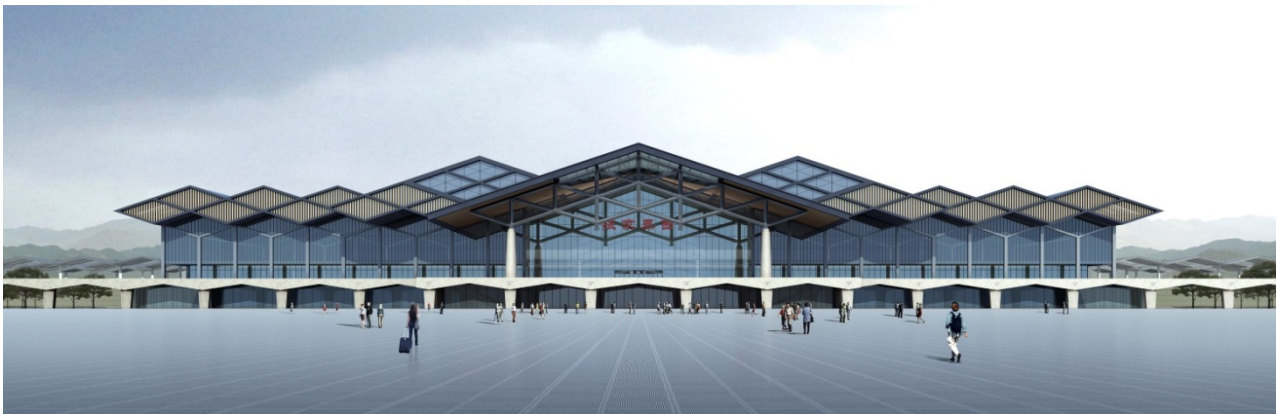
Front Elevation of Zhangjiajie West Railway Station
